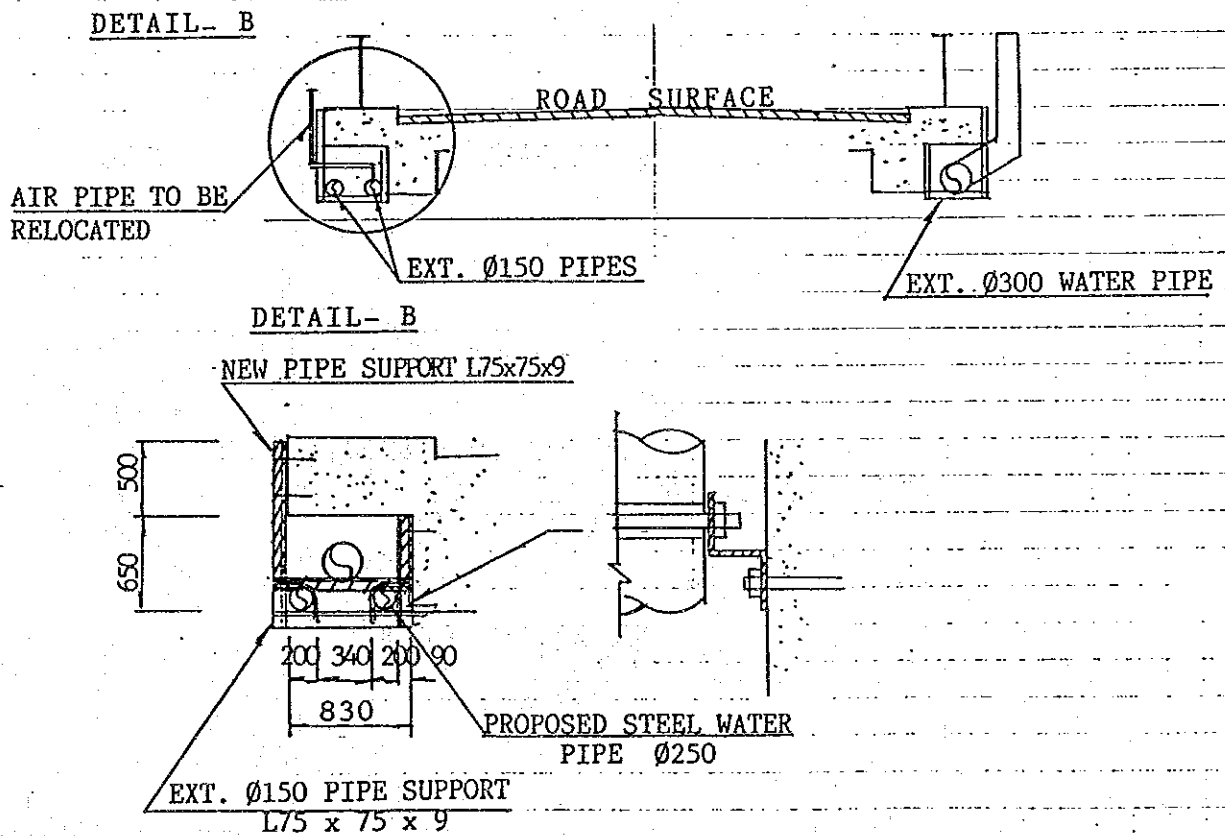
WATER PIPE LINE ALONG MALAKAL BRIDGE
